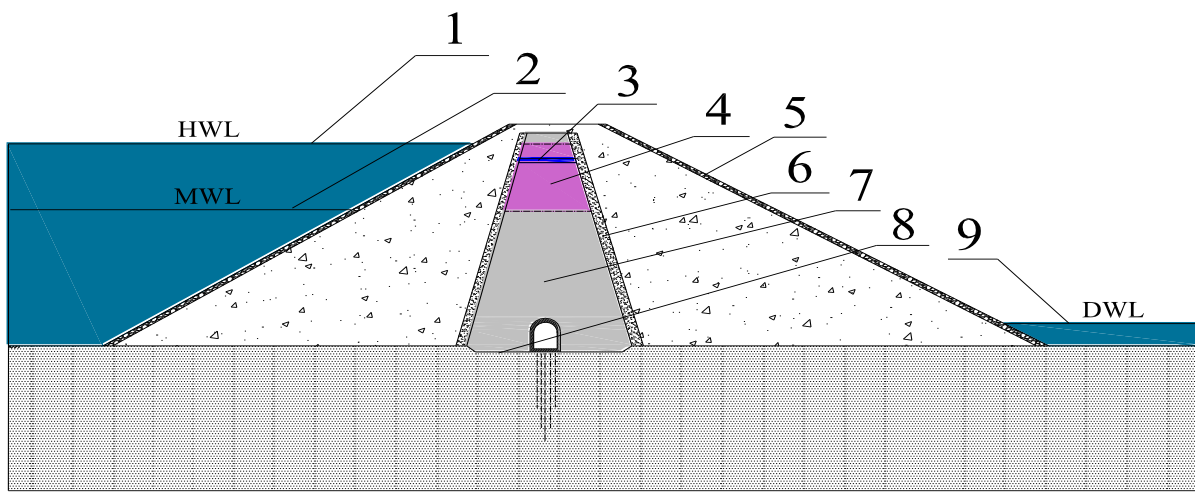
Cross section of the dam. 1 – head water level; 2 – minimum water level; 3 – crack; 4 – zone of risk; 5 - downstream pavement; 6 – transitional layer; 7 – core; 8 – zone of possible erosion; 9 – downstream water level.
